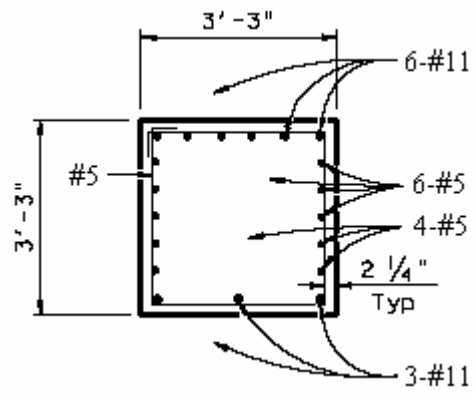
Lake Ray Hubbard Bridge Project – Bent Cap Reinforcement at Connection Zones
